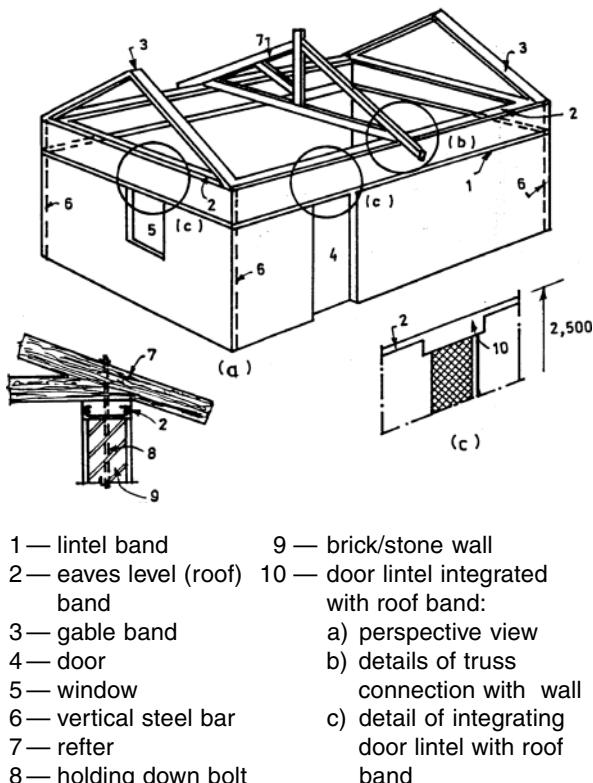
OVERALL ARRANGEMENT OF REINFORCING LOW STRENGTH MASONRY BUILDING HAVING PITCHED ROOF
